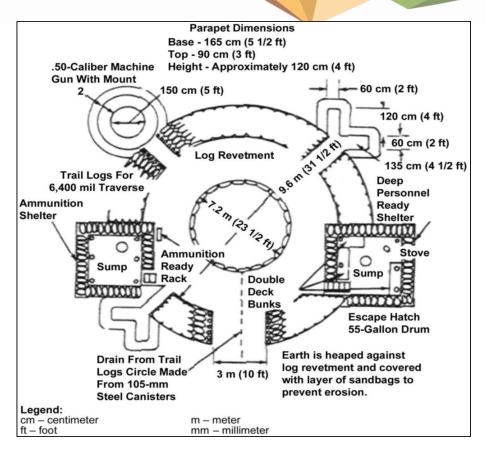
Towed howitzer emplacement (105-millimeter and 155-millimeter howitzer) completed emplacement)
